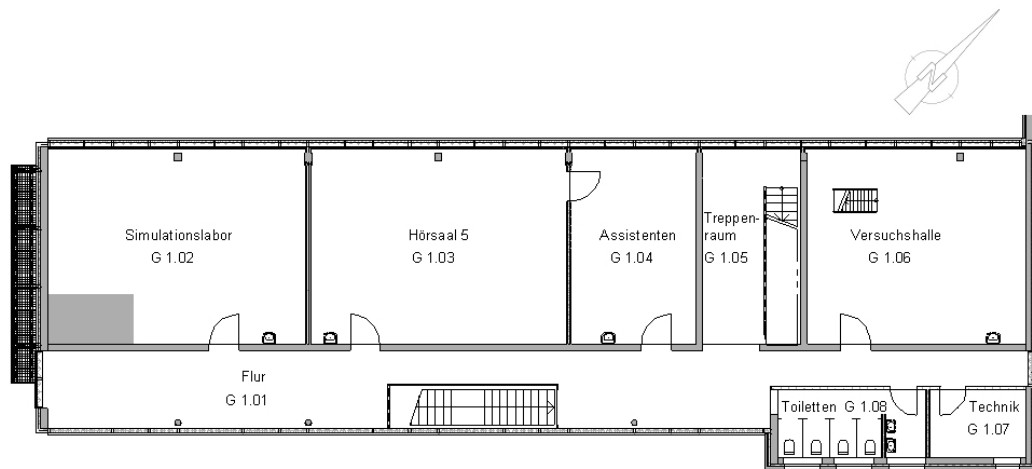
Floor plan of the building *Technikum* showing the first floor and the laboratory room G1.02. The glass compartment is indicated by the solid grey rectangle in the plan. (drawing based on: Koenigsdorff and Sedlak (2005))
